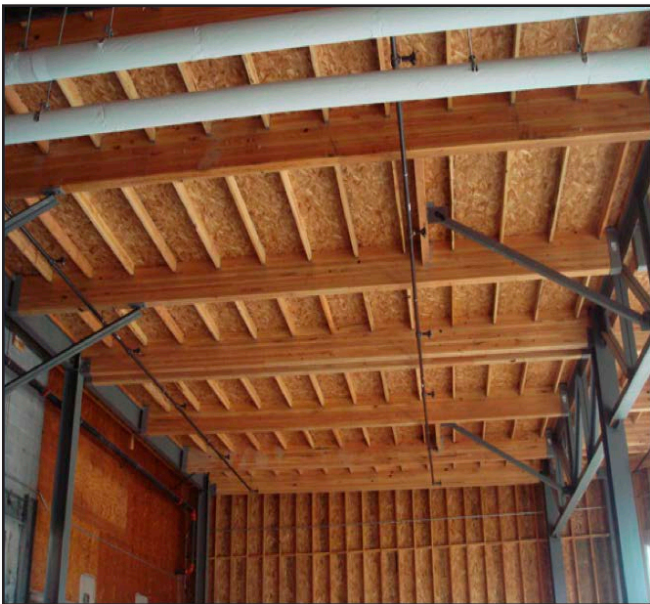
Panelized roof system with steel truss beams and laminated wood purlins
